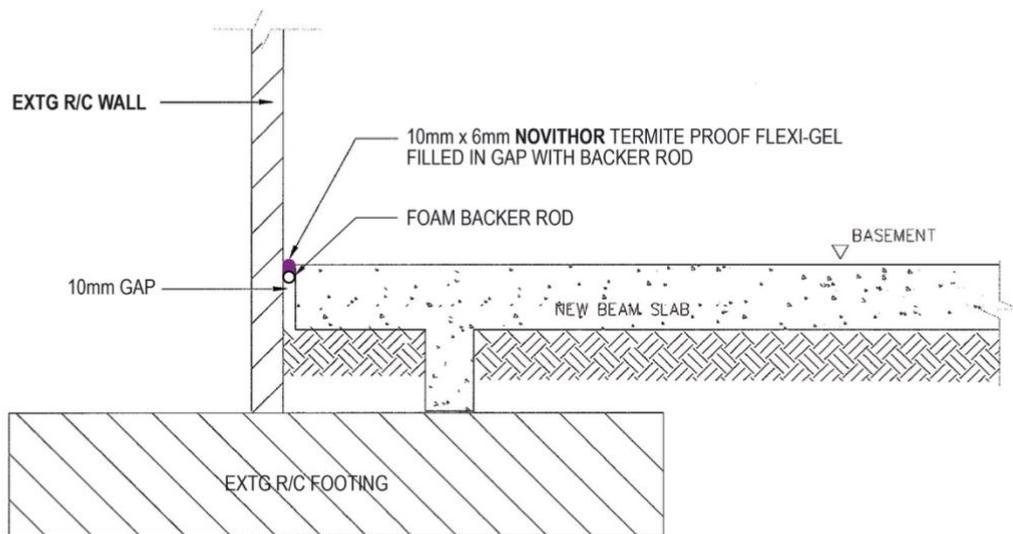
NOVITHOR Flexi-Gel protecting construction joint.
